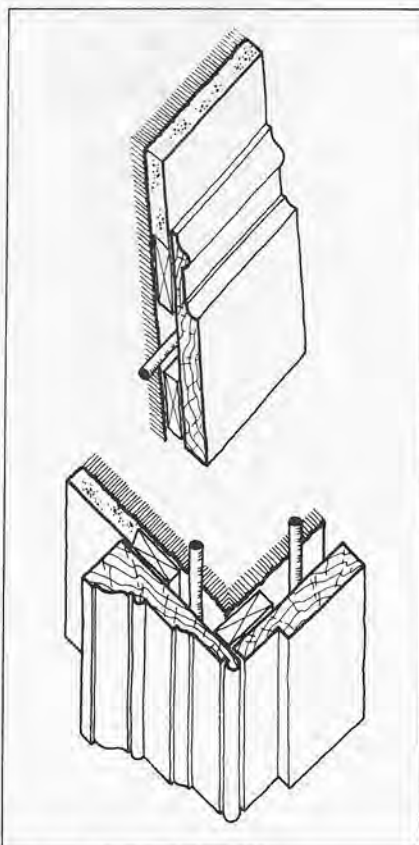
Potential cable routes between the double grounds to the skirting, architrave and door lining
